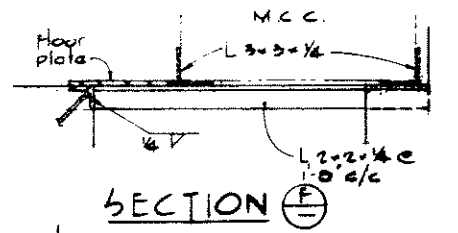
TYPICAL FLOOR PLATE FIXING
